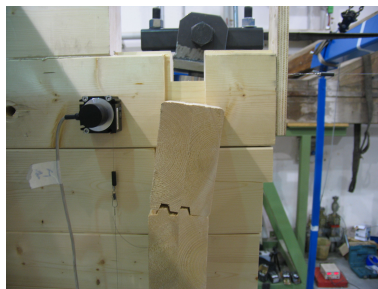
Failure of the corner joint - "C" load condition according to section 5.2.1.
